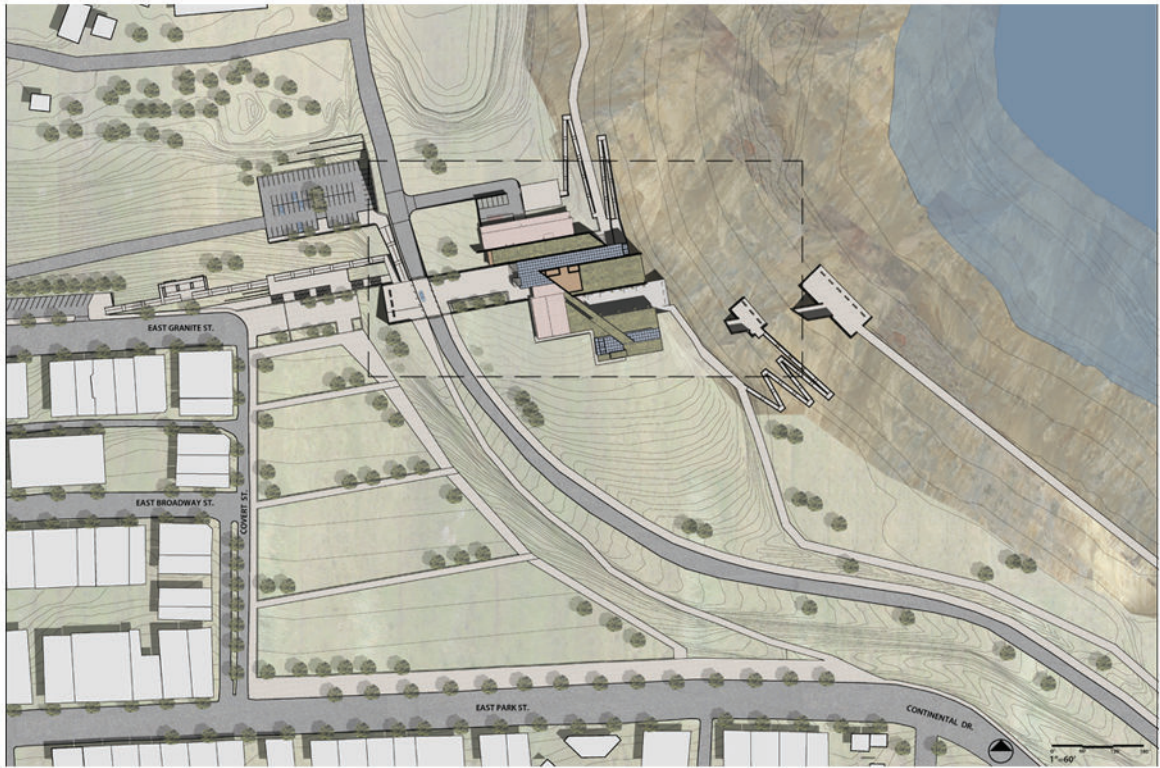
Site Plan showing the roof. [Drawing by Emily Childs]
